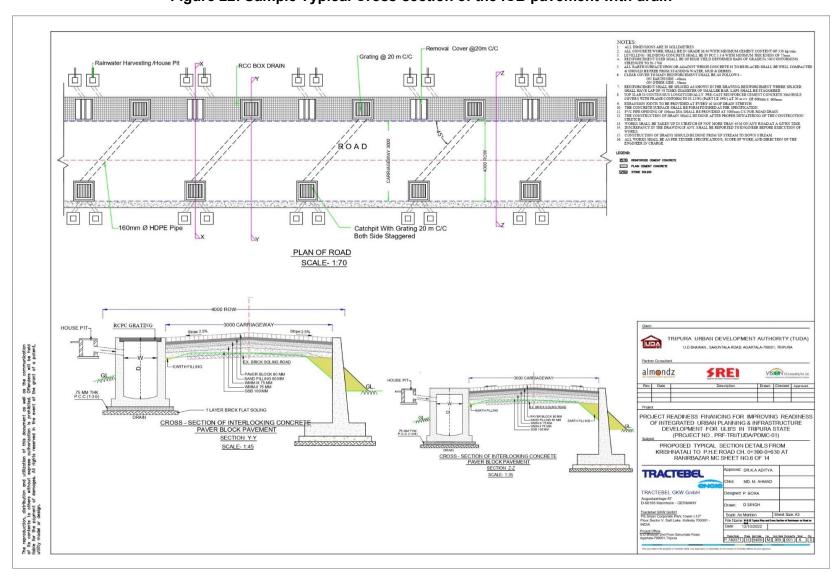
Sample Typical Cross-section of the ICB pavement with drain
